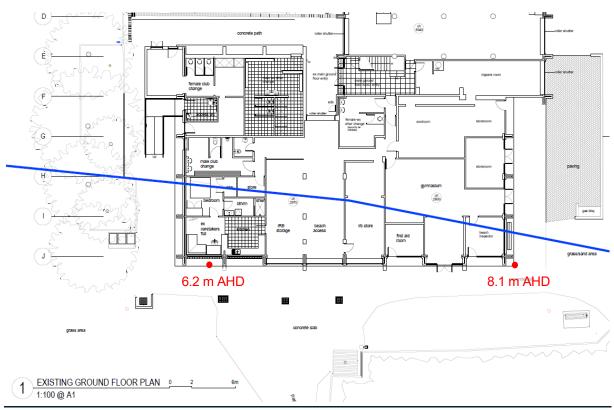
SLSC Existing ground floor: maximum vertical elevation for piled foundations to assume soil capacity based on ZRFC (see Figure 4).
